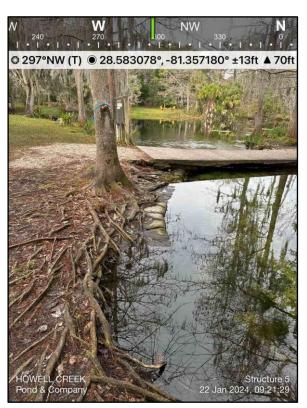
Pedestrian Bridge Crossing at Mead Botanical Garden Pond
